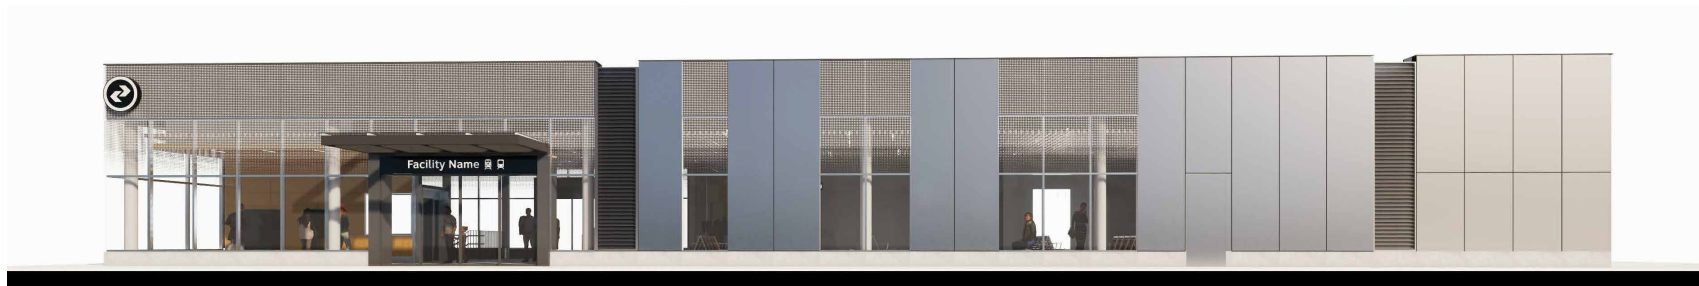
Rendering of a typical staffed station building (Plaza Elevation)
